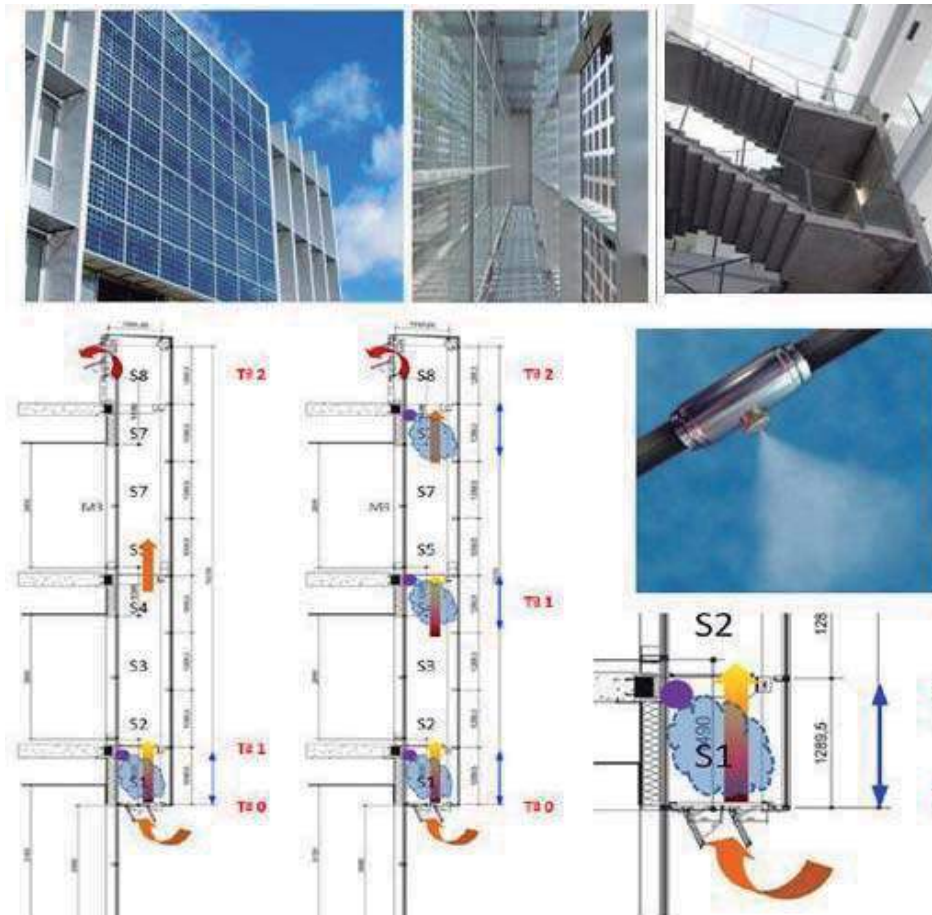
South-East elevation with double PV wall, and built-in photovoltaic glass skylights
